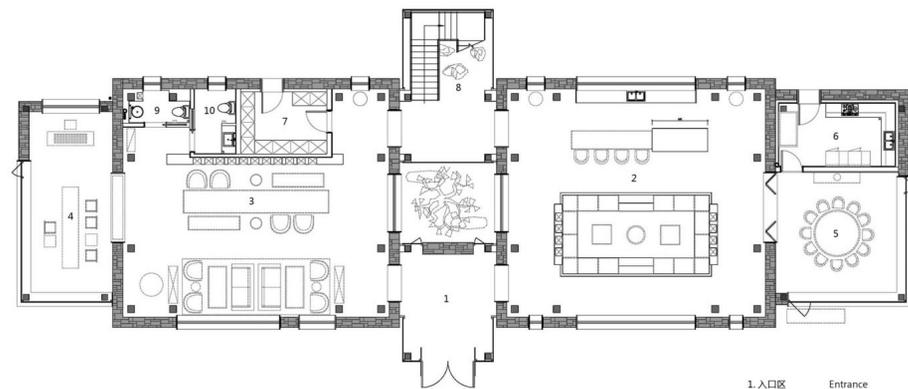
| Nanchawan · Shiwu Tribe Homestay, Floor Plan credited to [The Design Institute of Landscape & Architecture China Academy of Art]
